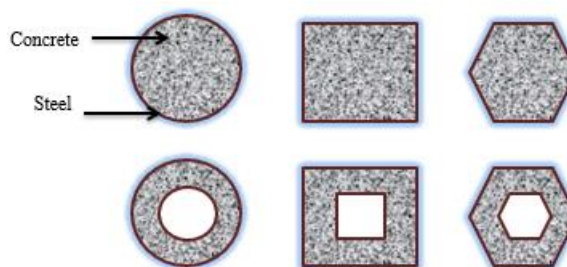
Cross-sections of solid and hollow CFST composite columns.
